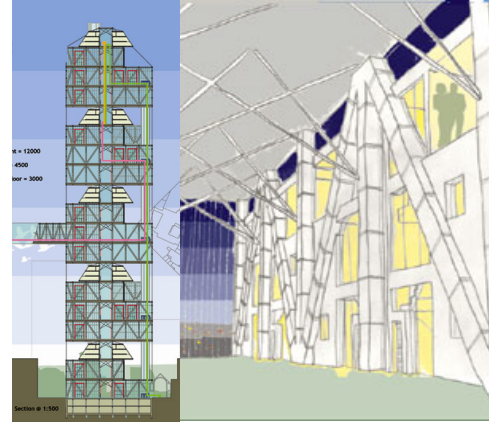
“Streets in the Air”: (a) Section, (b) Internal ‘street’ view
